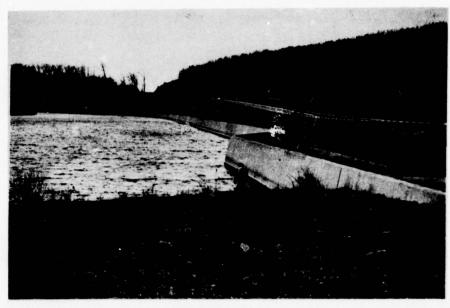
View of reservoir side of wall from right embankment; water level at 741.5 (Photo taken May 1, 1978)
